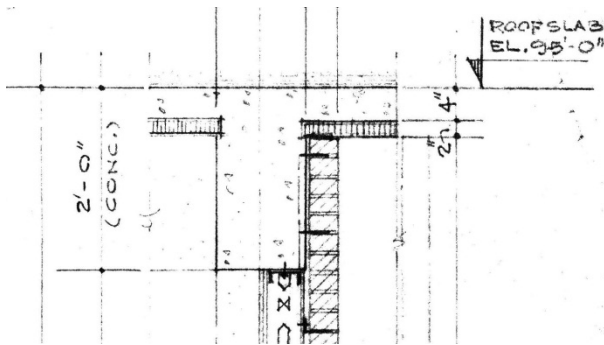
Section detail at top of interior brick veneer wall at stairway, showing Tectum form plank extending beyond the face of the brick. [From 1968 Drawing A-24, Section 2.]
